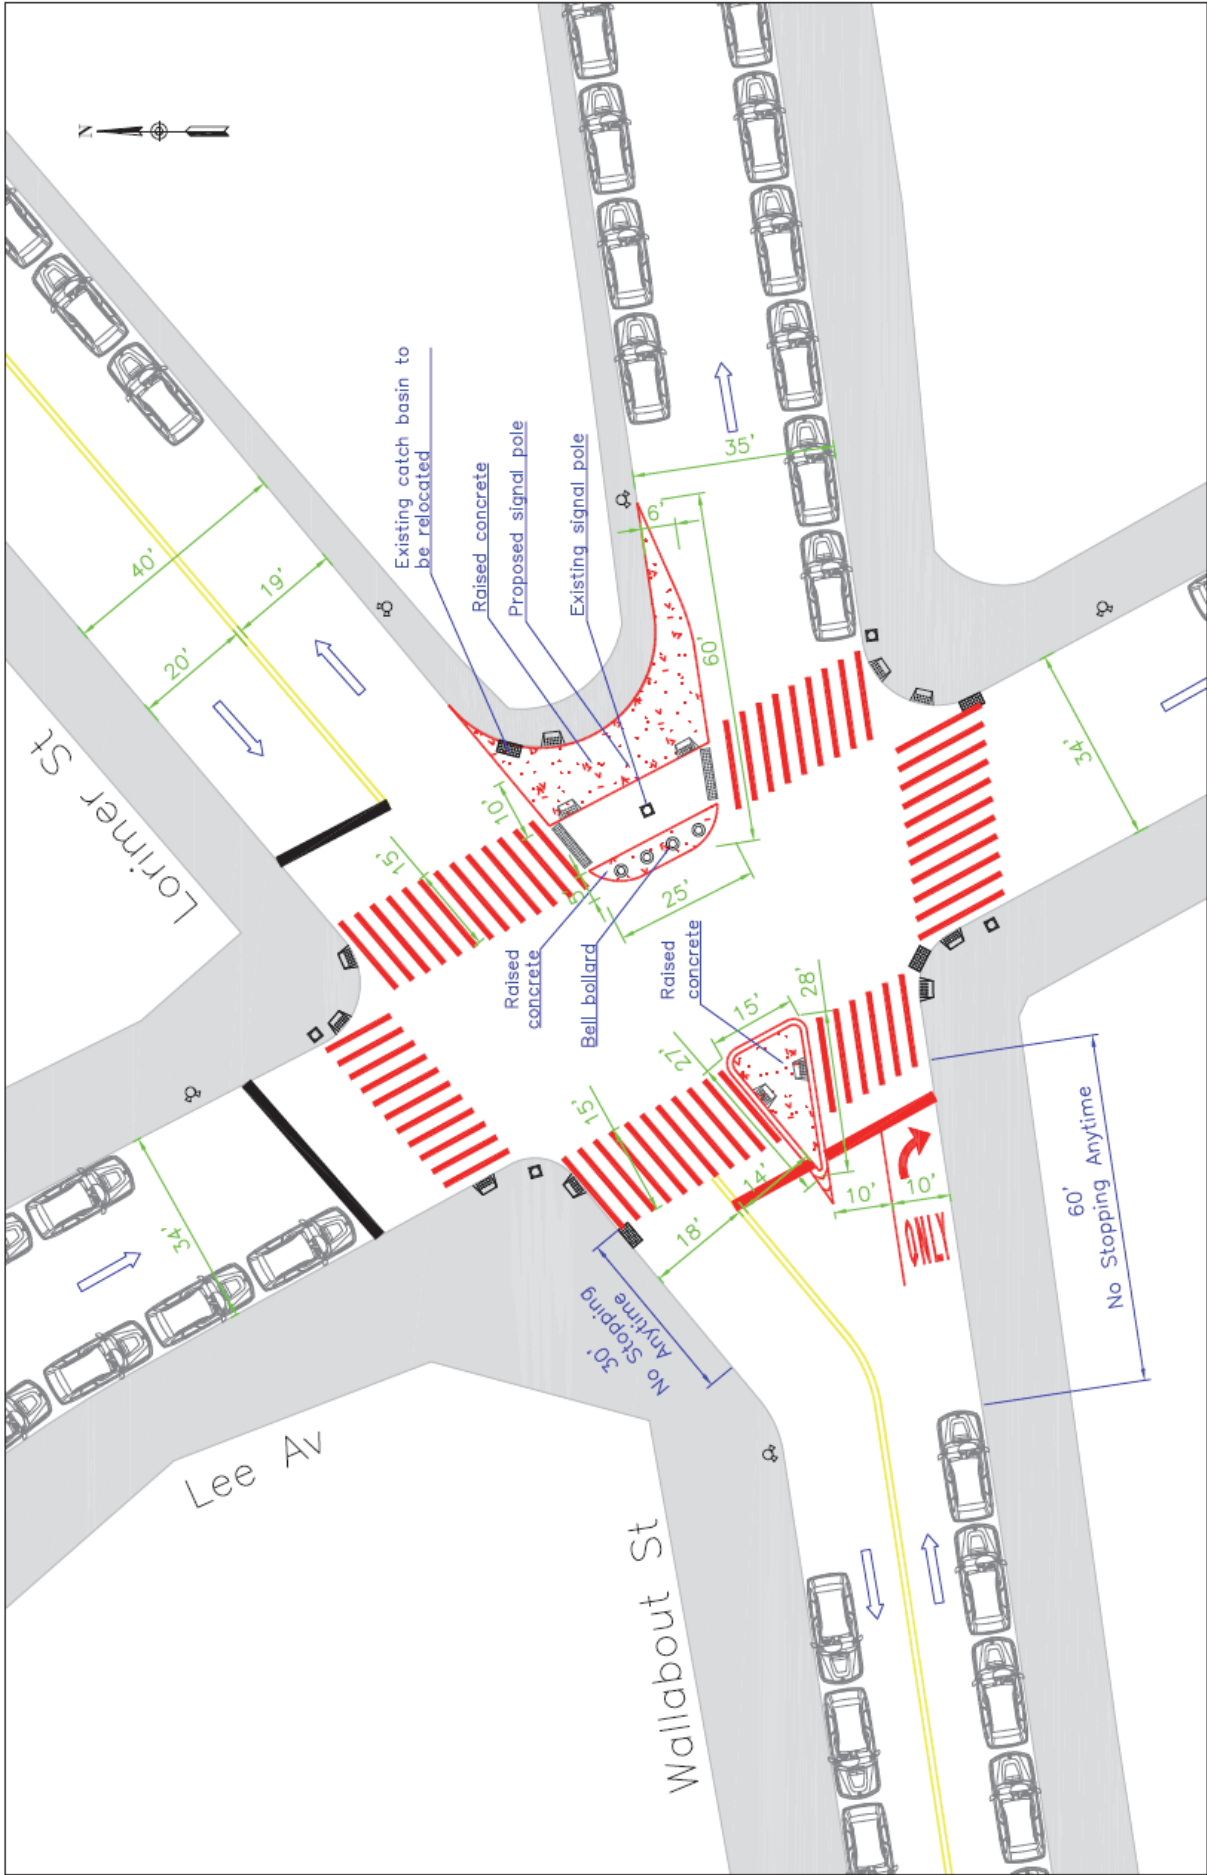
Wallabout Street and Lee Avenue – Proposed
